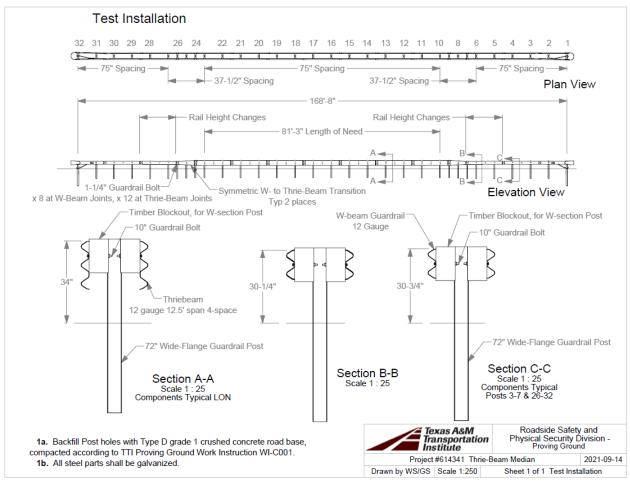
Plan View and Elevation View of Median TGS Installation.
